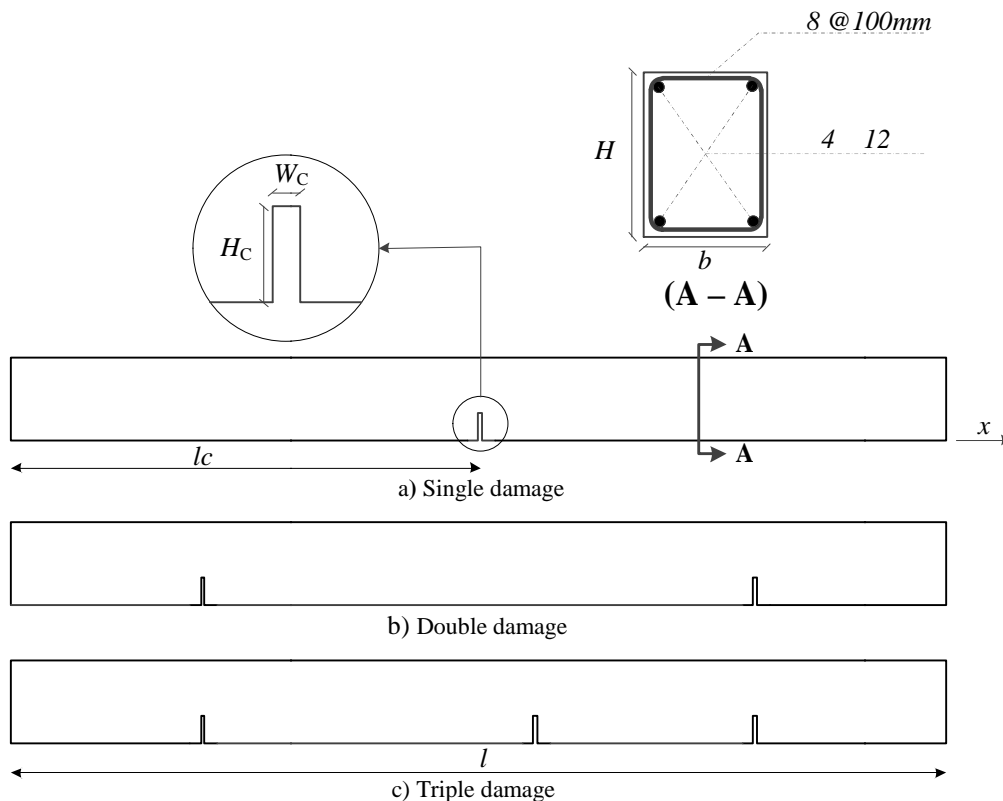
Model of damaged reinforced concrete beam: a) Single, b) Double and c) Triple damage scenario
